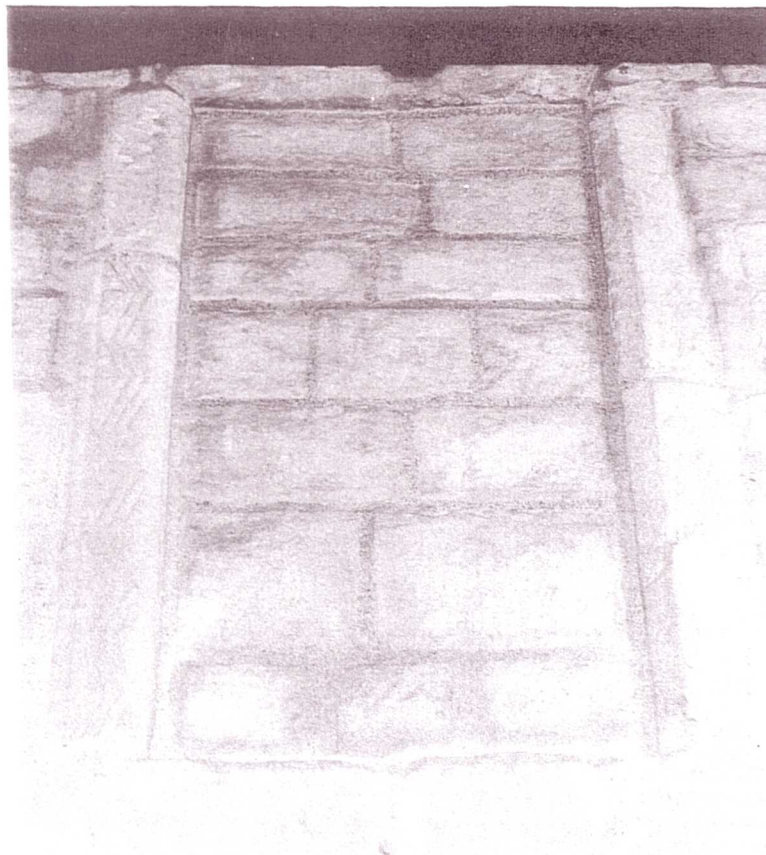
Blocked opening on south wall of North Hall at Tunstall Gallery level.
